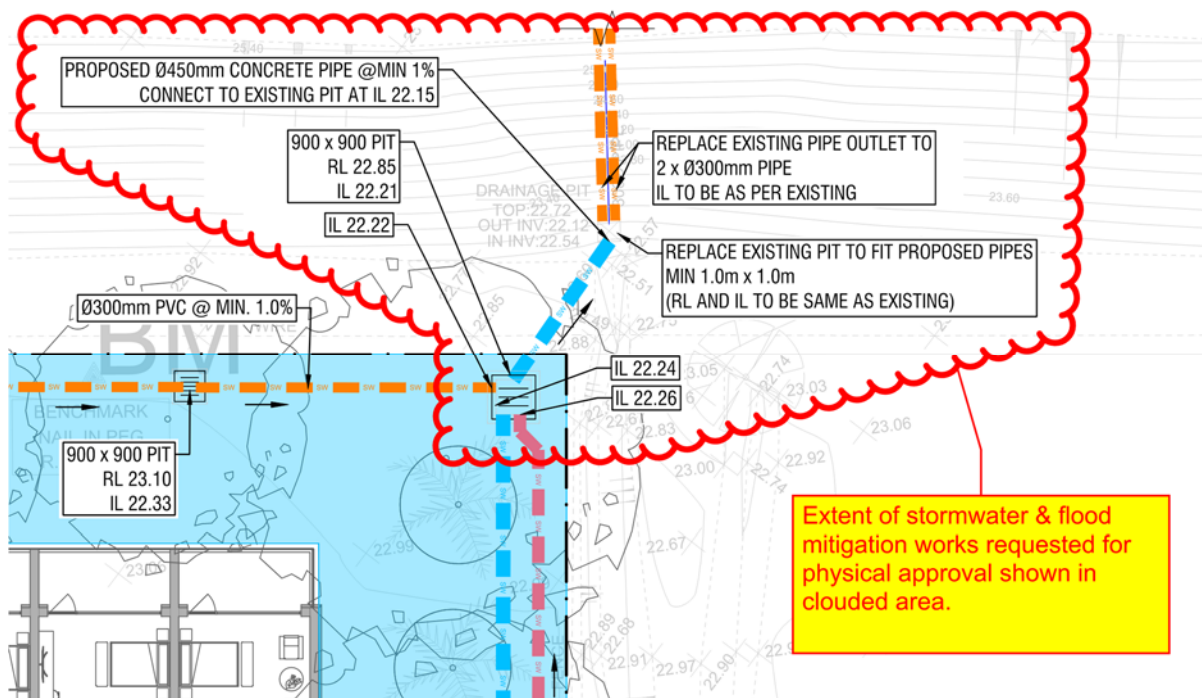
Extract from Stormwater and Civil Drawings – Ground Level, Lot 12.
